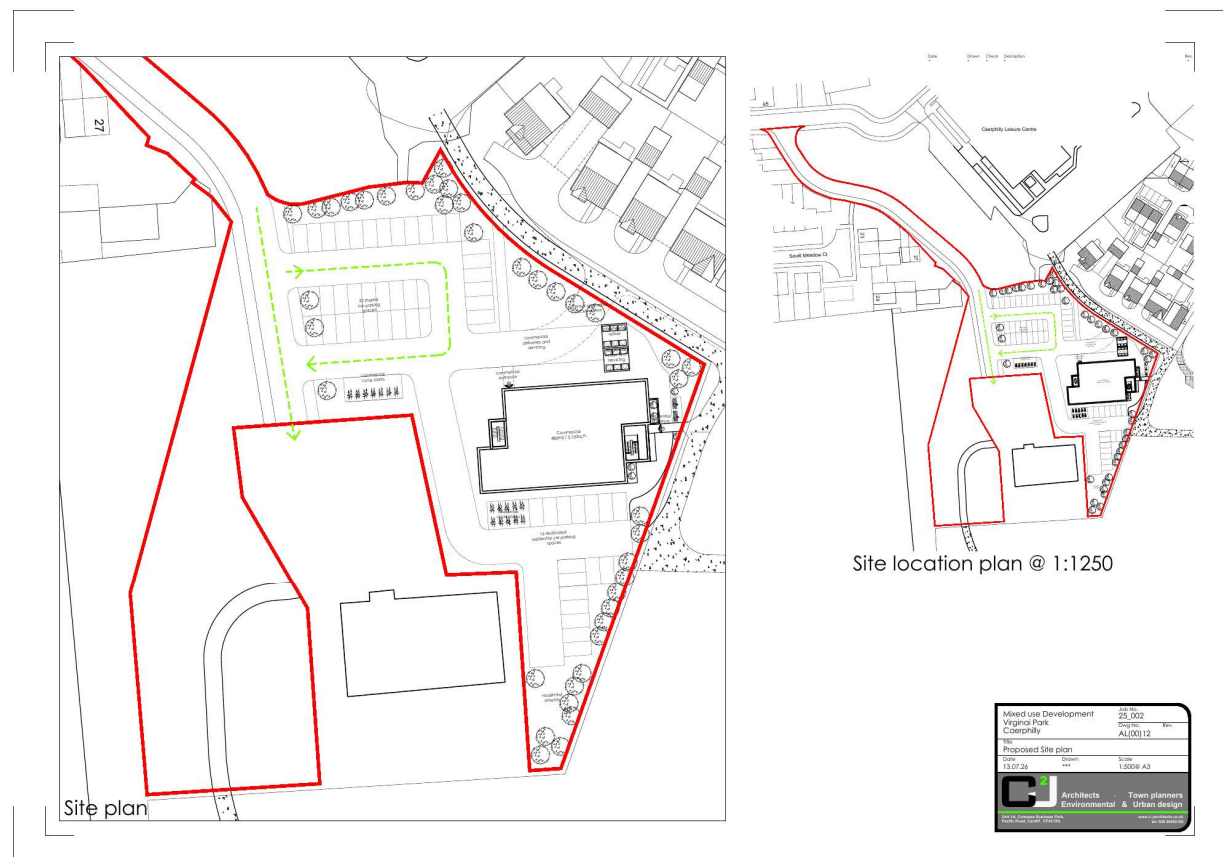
Proposed site plan. Source: C2J Architects, AL(00)12.
